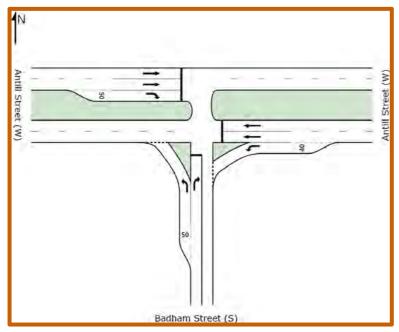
Recommended Layout for the Intersection of Antill Street and Badham Street
